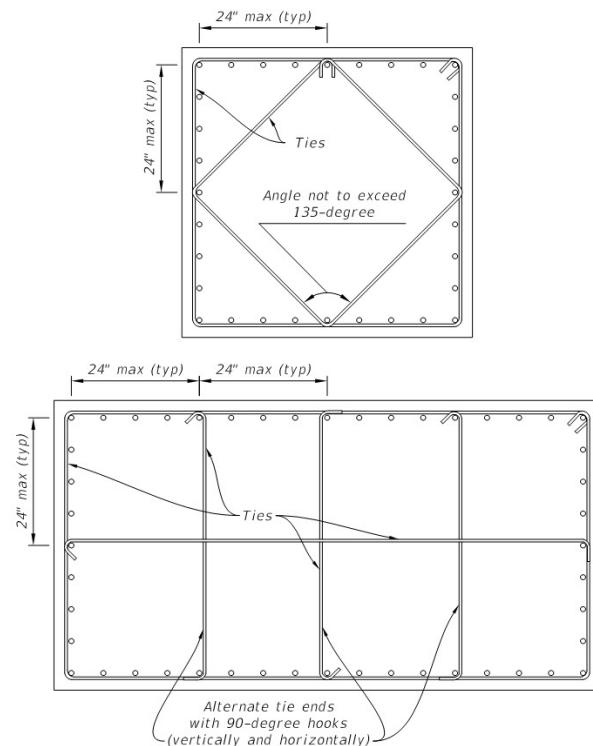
Acceptable Tie Arrangements in Locations not Designed for Plastic Hinging
